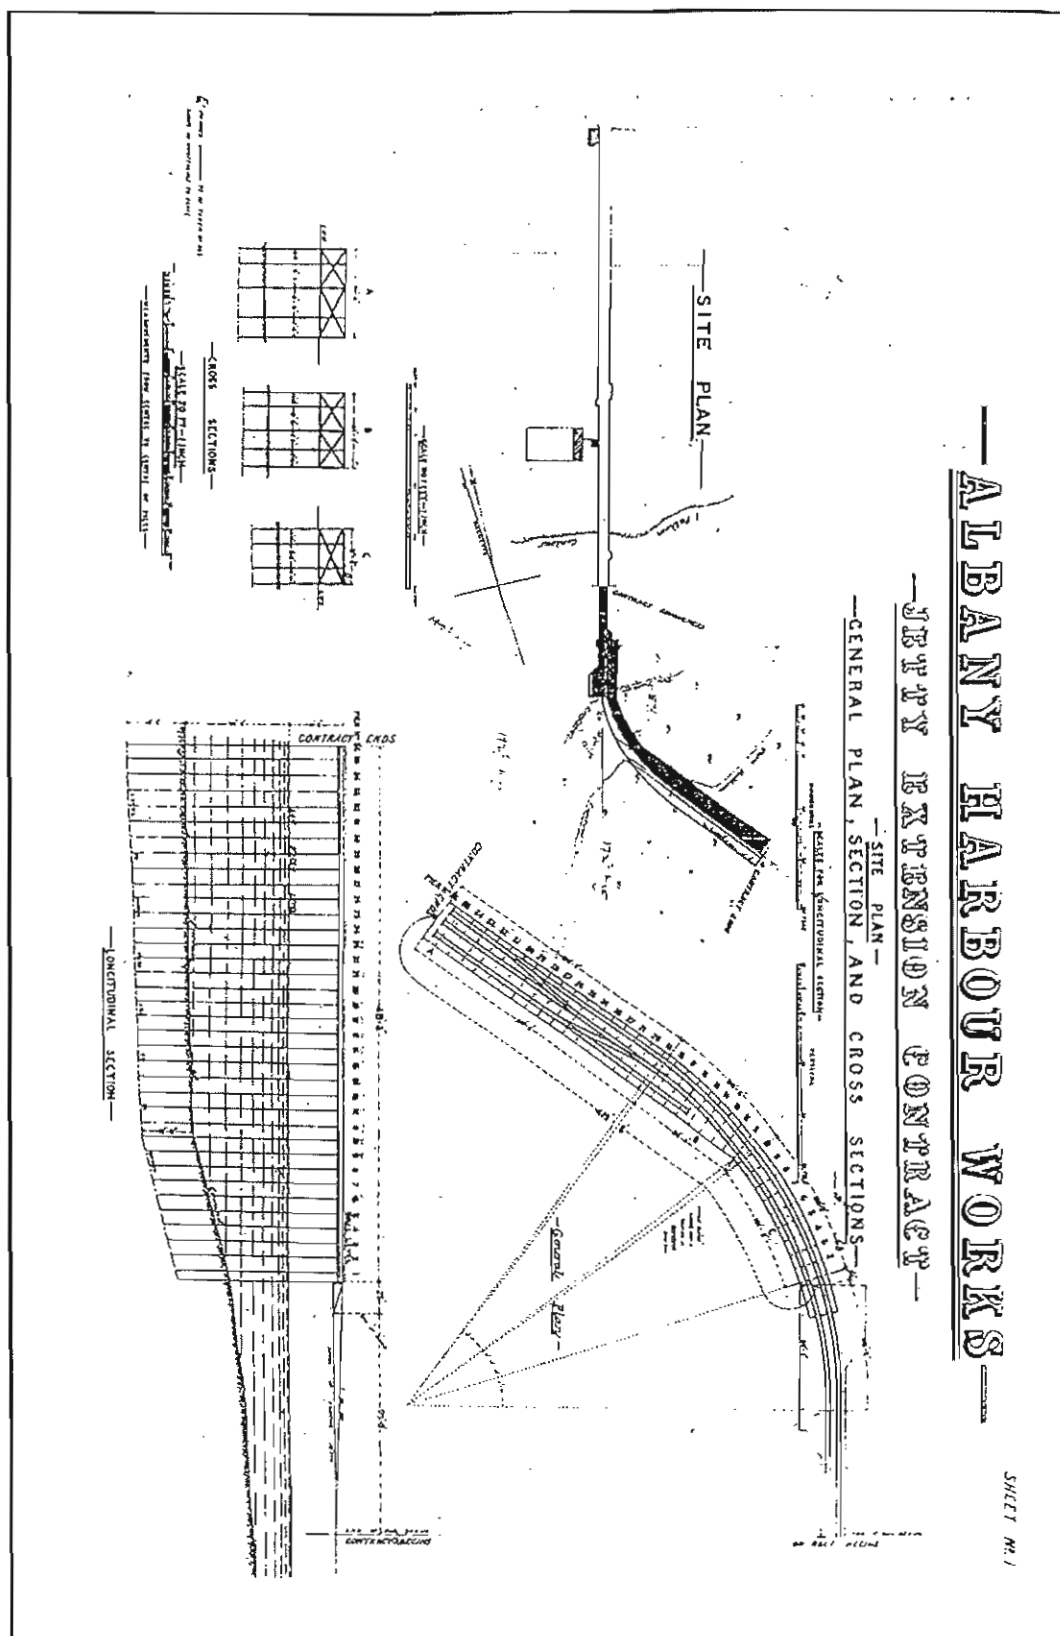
Plan: Albany Harbour Works; Jetty extension contract. Sheet No. 1.
